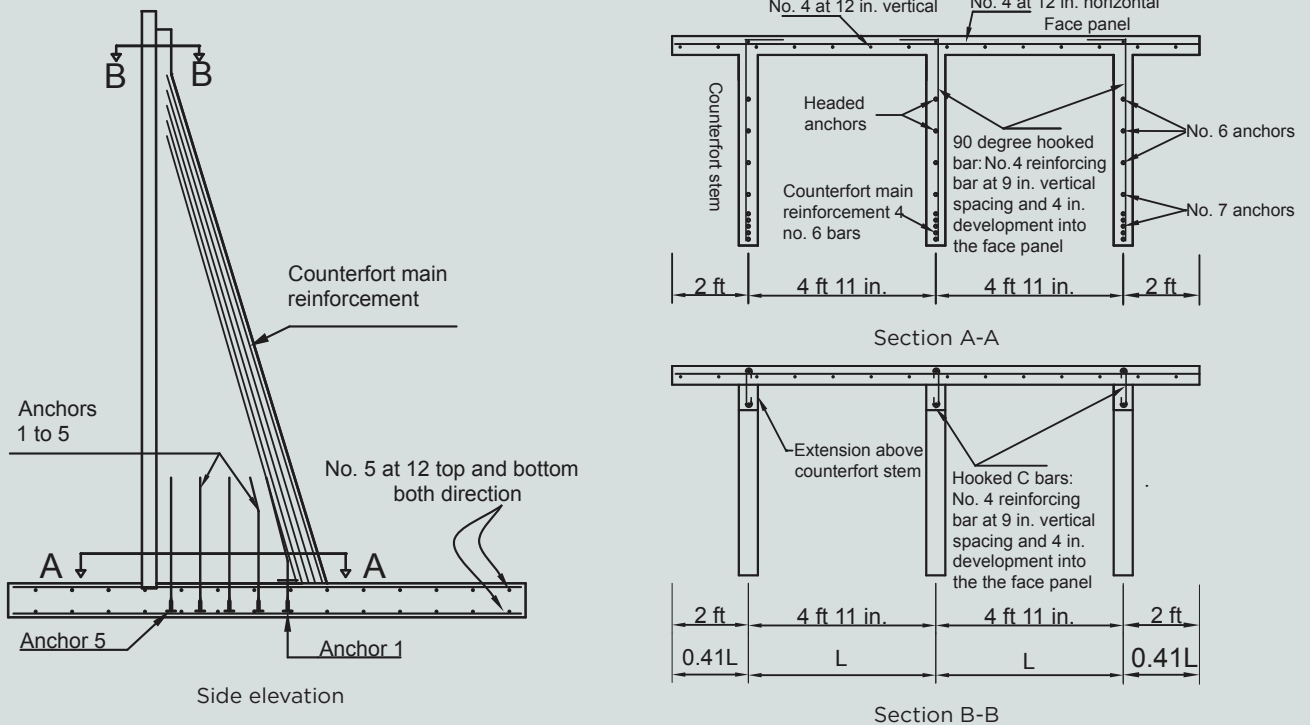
Steel reinforcement details of the totally prefabricated counterfort retaining wall system. Note: L = center-to-center spacing between two adjacent counterforts. Note: no. 4 = 13M; no. 5 = 16M; no. 6 = 19M; 1 in. = 25.4 mm; 1 ft = 0.305 m.
